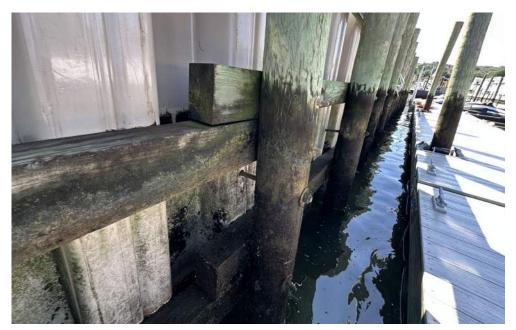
Section A, Easternly Bulkhead Waler Lap Connection, View 2
